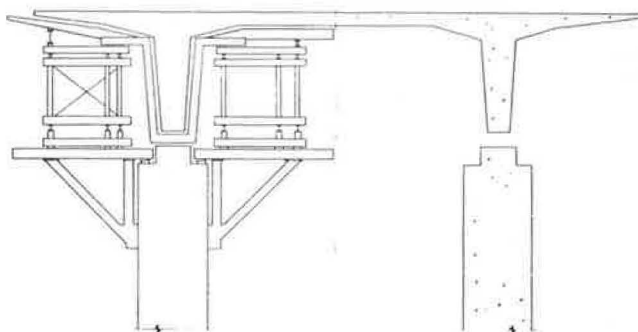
Span-by-span box-girder construction with below-deck erection trusses.
